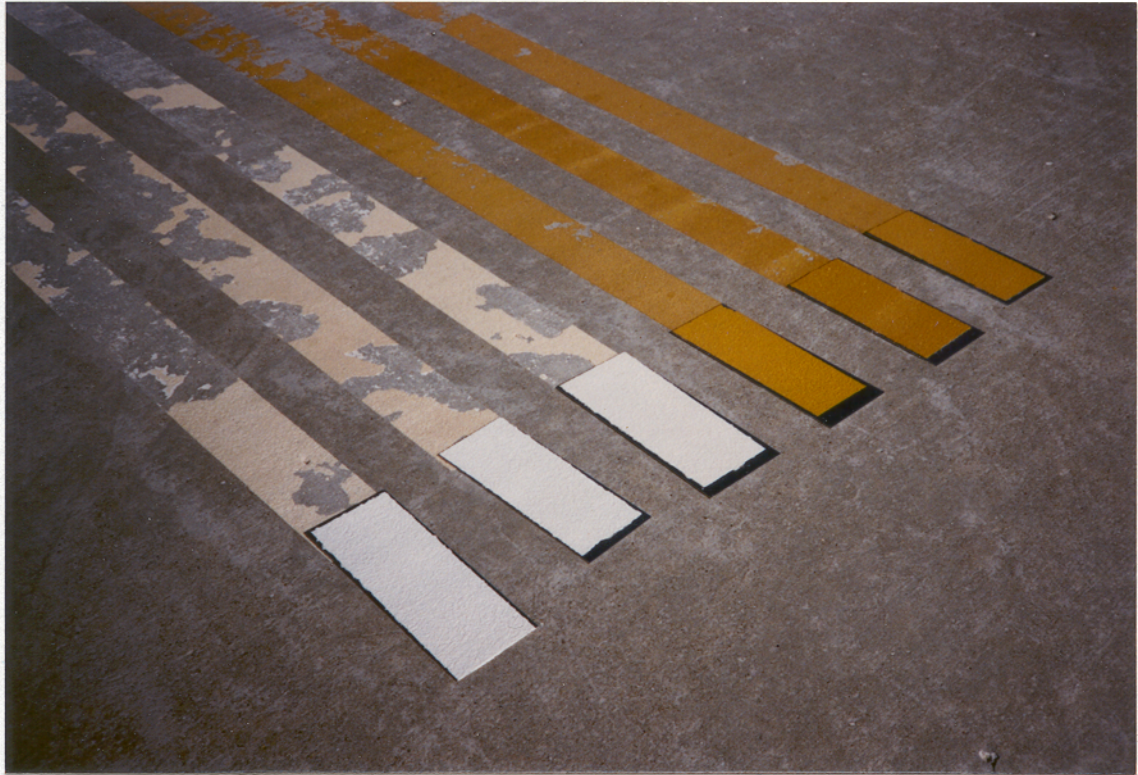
EPOXY NO. 1 TAXIWAY TEST STRIPE AFTER 1 YEAR - PITTSBURGH
